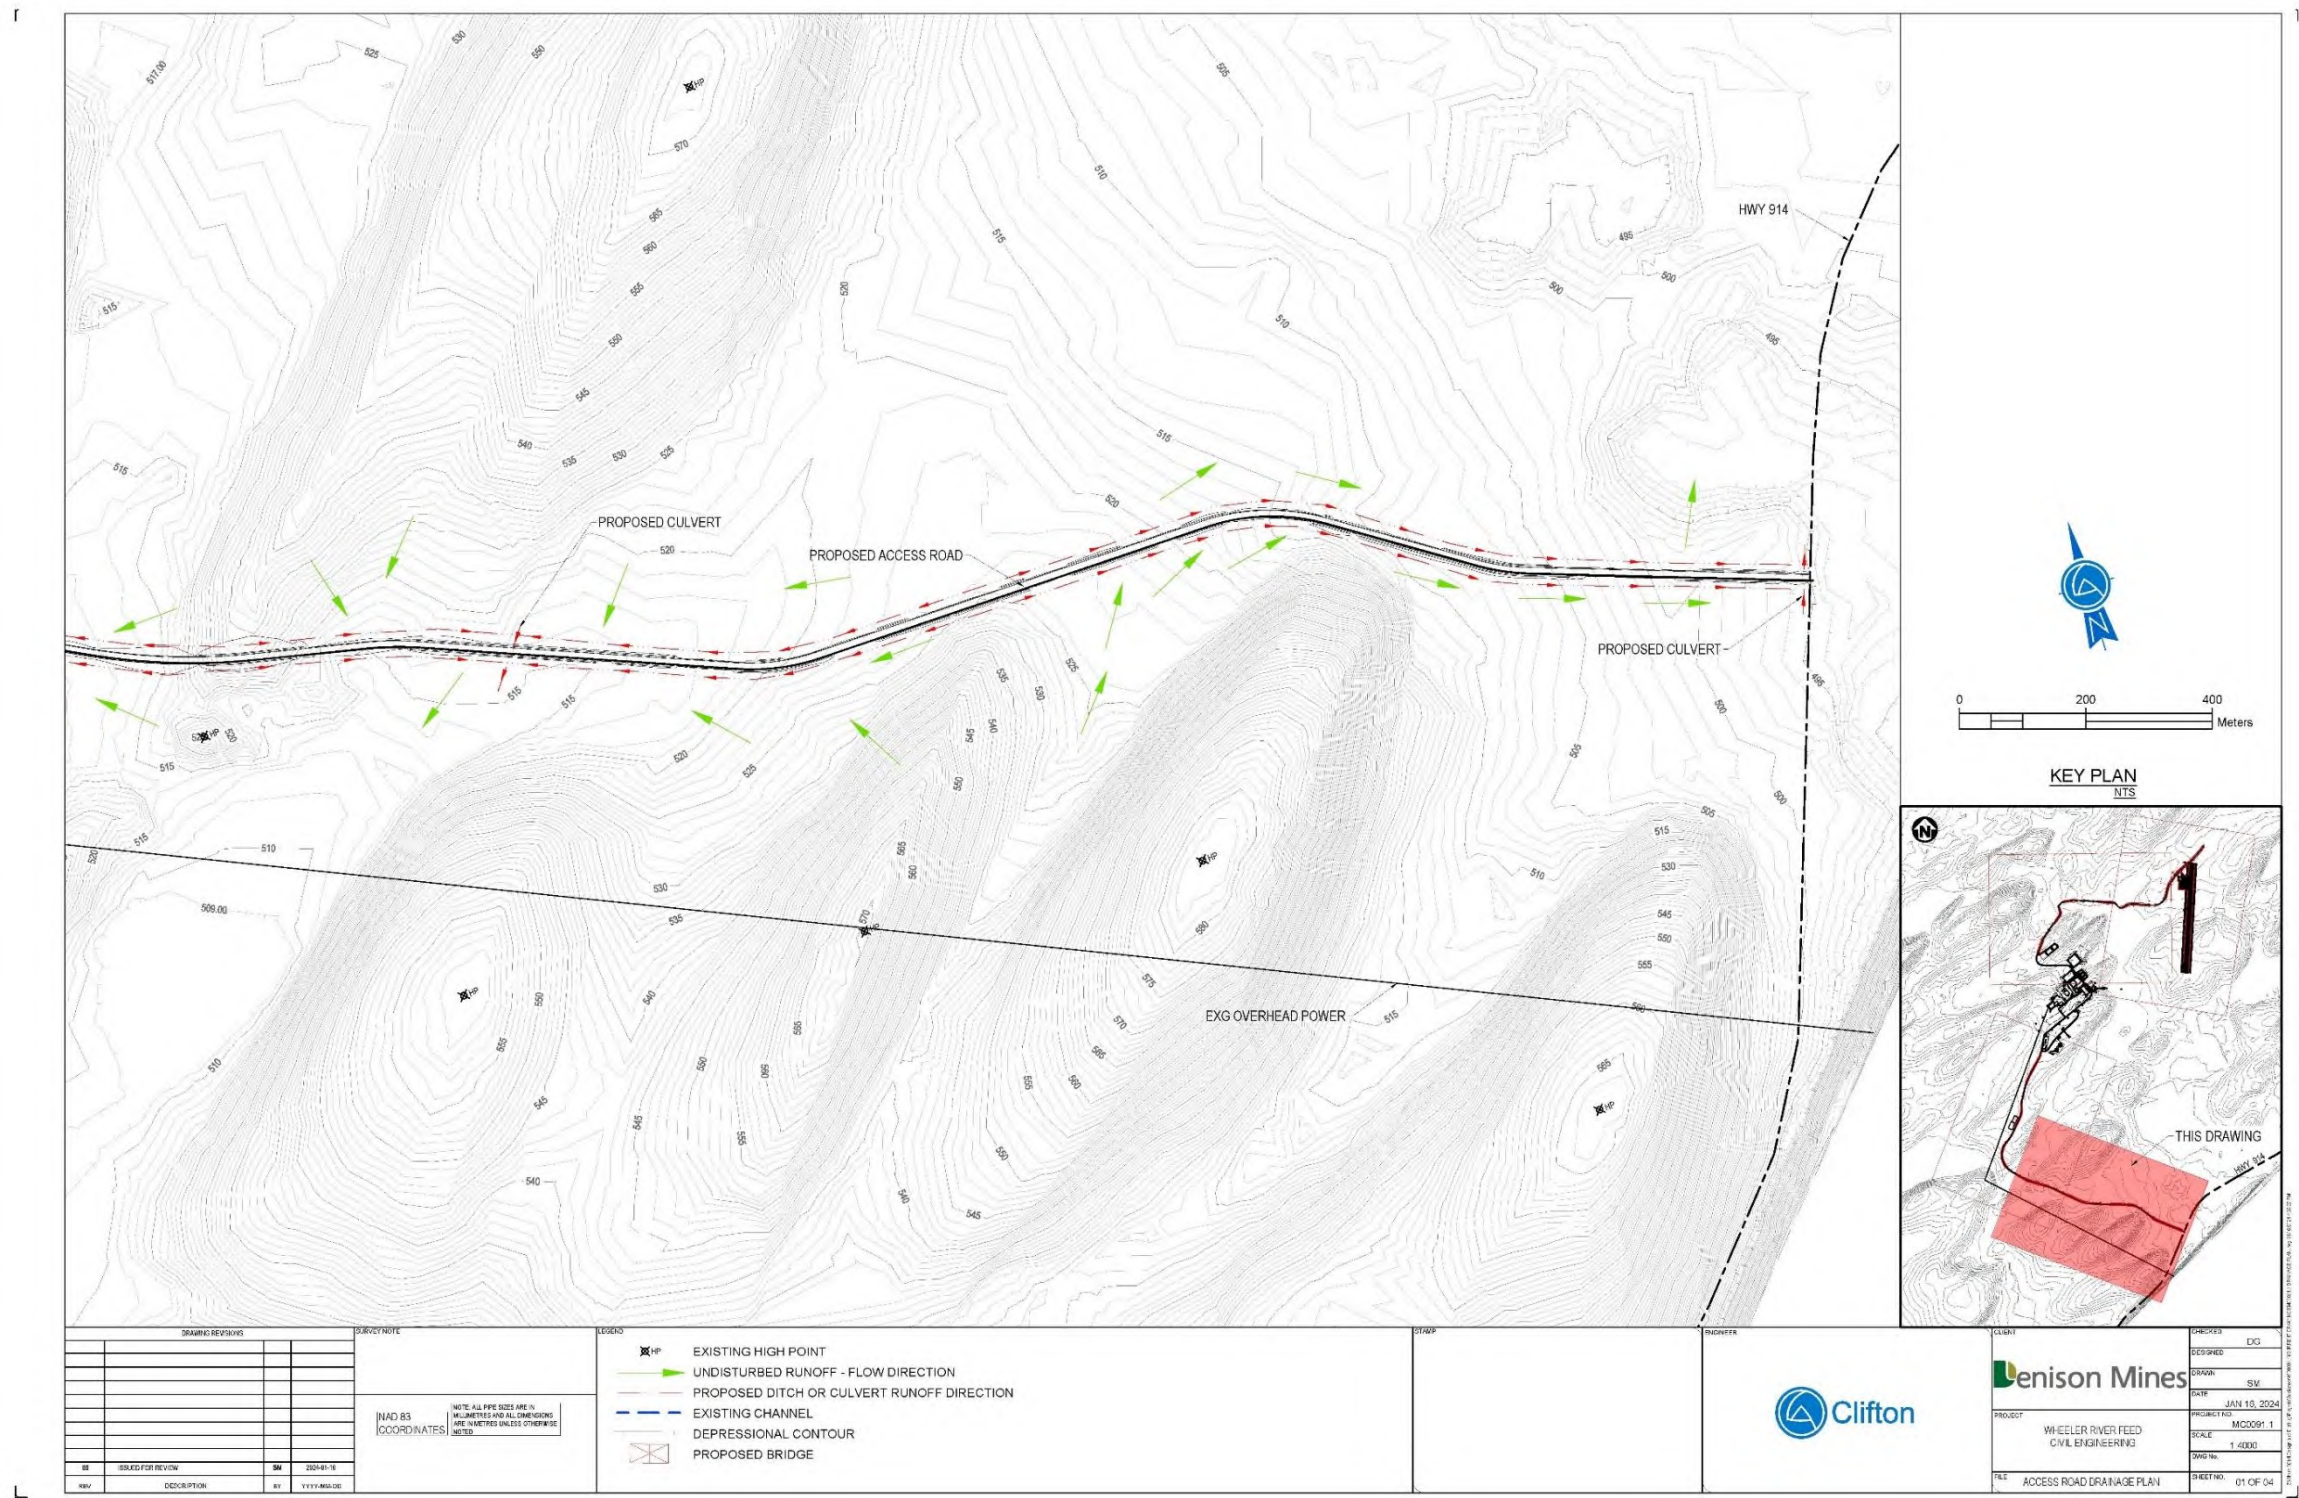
1: Conceptual Site Drainage – Access Road (segment 1 of 2)
